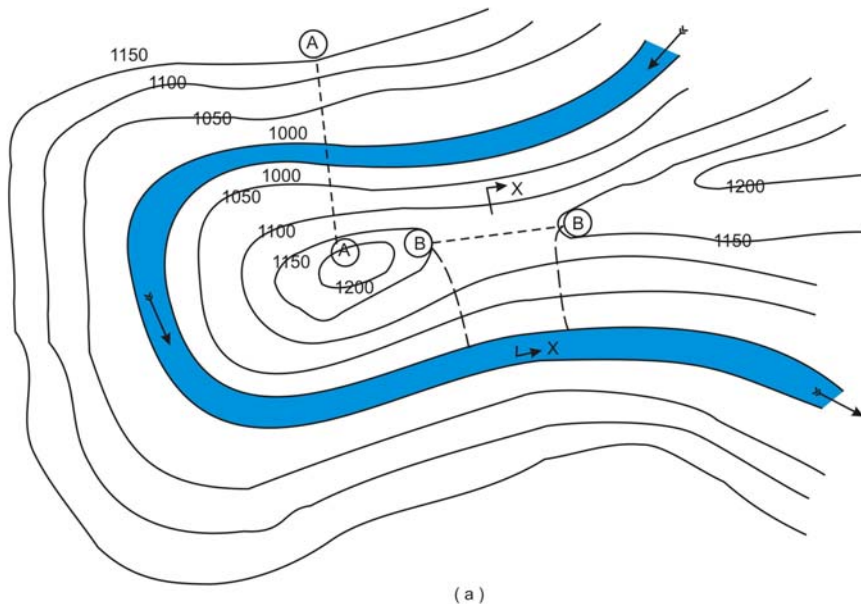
(a). Schematic layout of a dam and spillway proposed at a river bend
